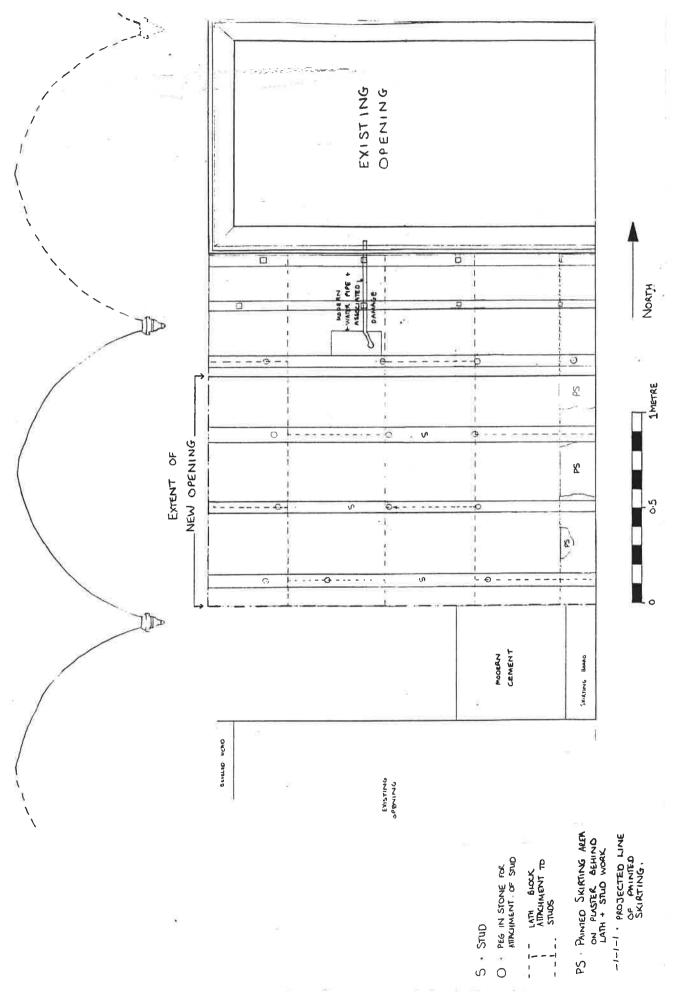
Site drawing showing east side of the investigation area. Lath and stud foundation and painted skirting area.
